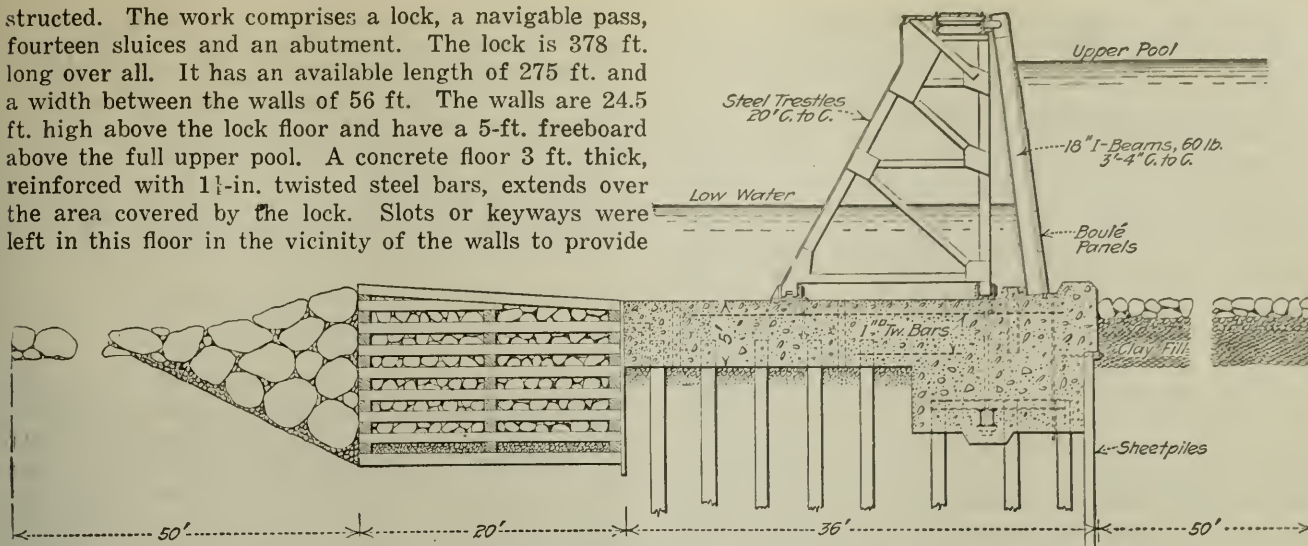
CROSS-SECTION THROUGH NAVIGABLE PASS ON RIVER MURRAY IMPROVEMENT
